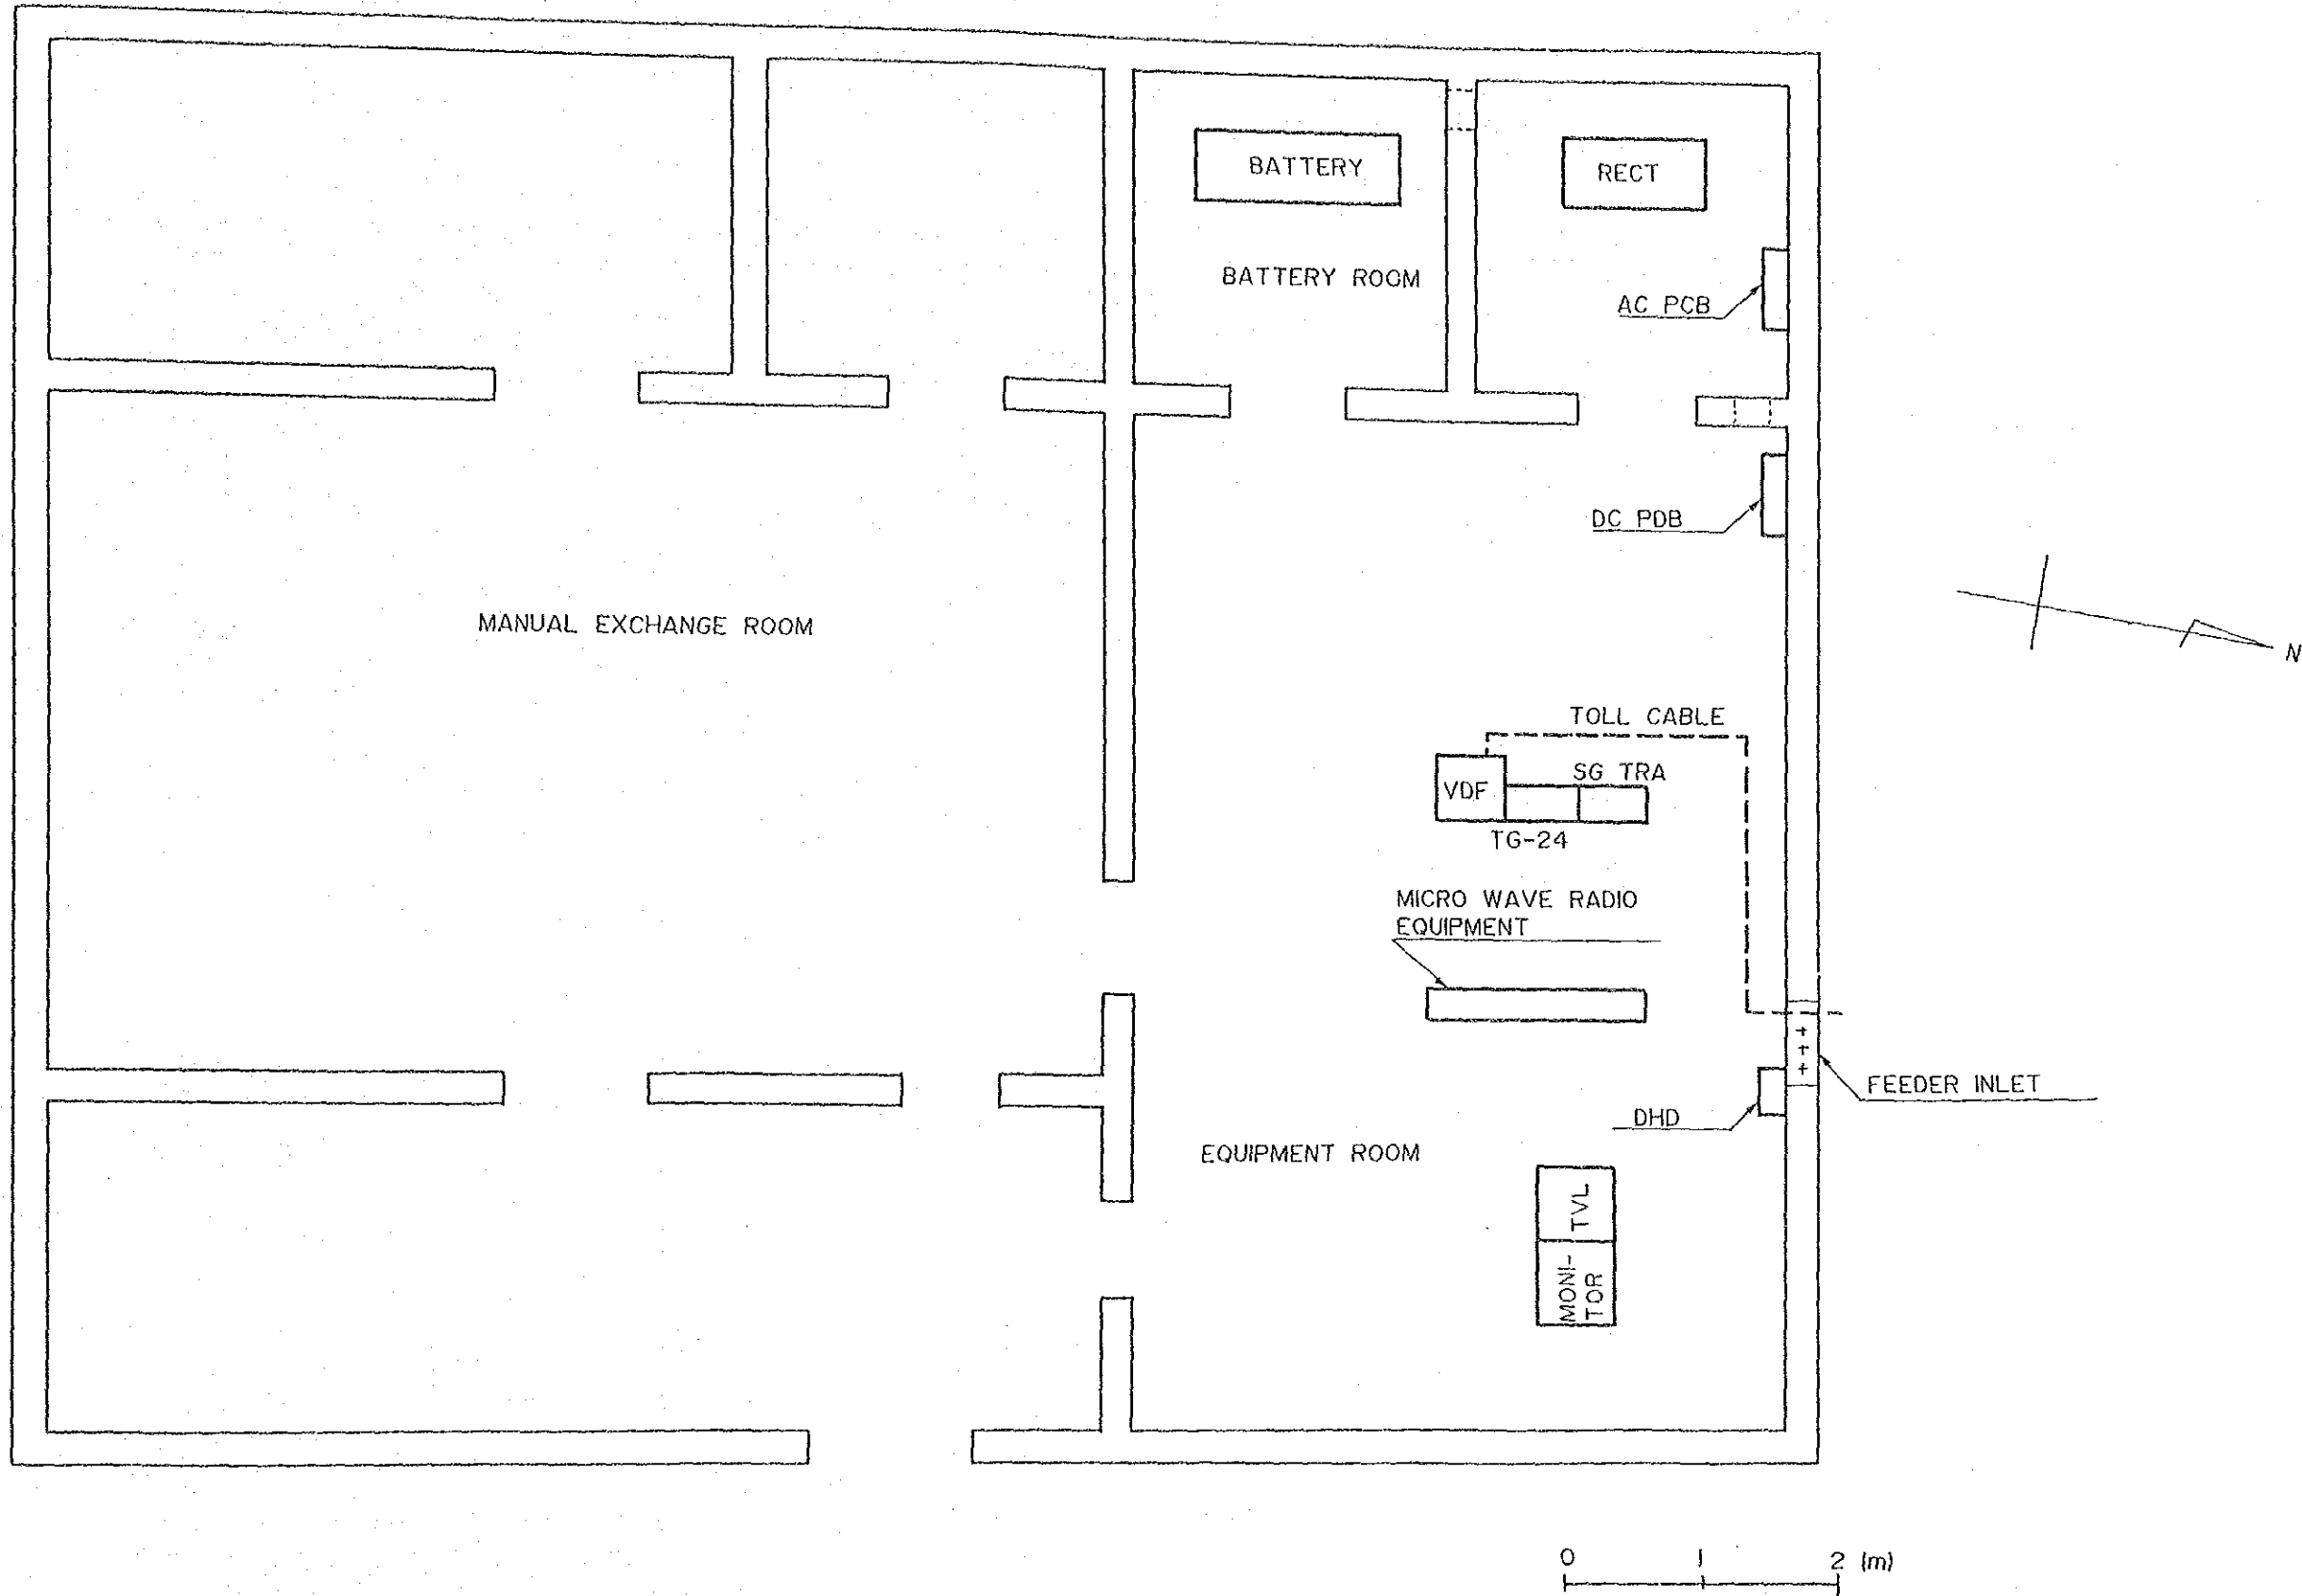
Floor Layout at Maubin Microwave Station
